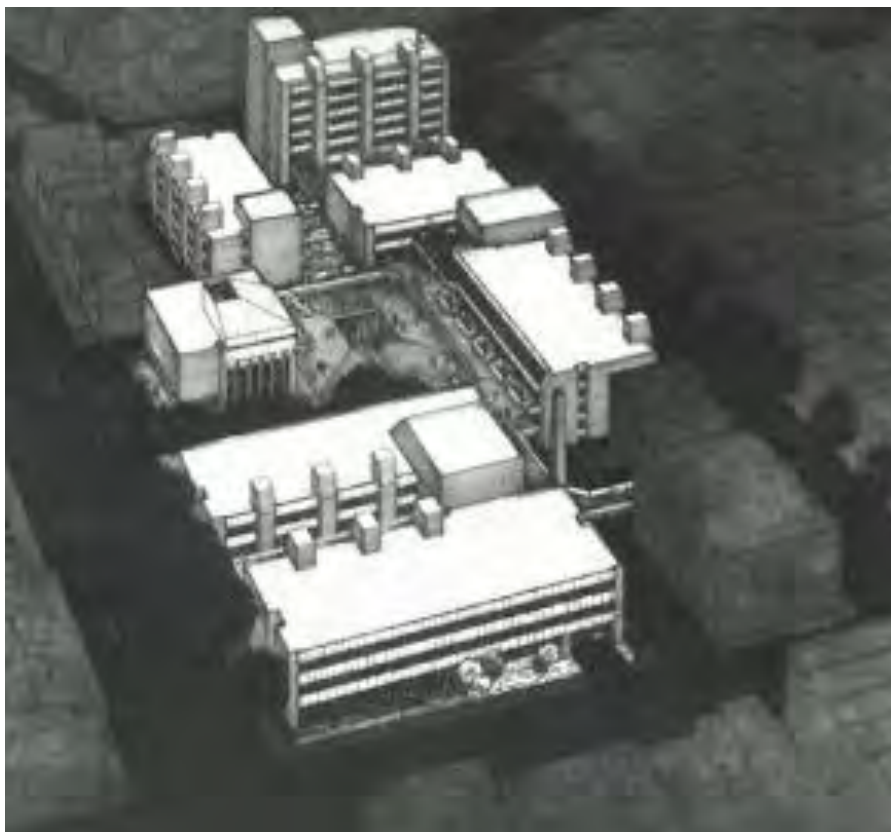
The Demaine plan of the RMIT block fronting Lygon, Victoria, Cardigan and Queensberry streets, looking south towards the CBD.
